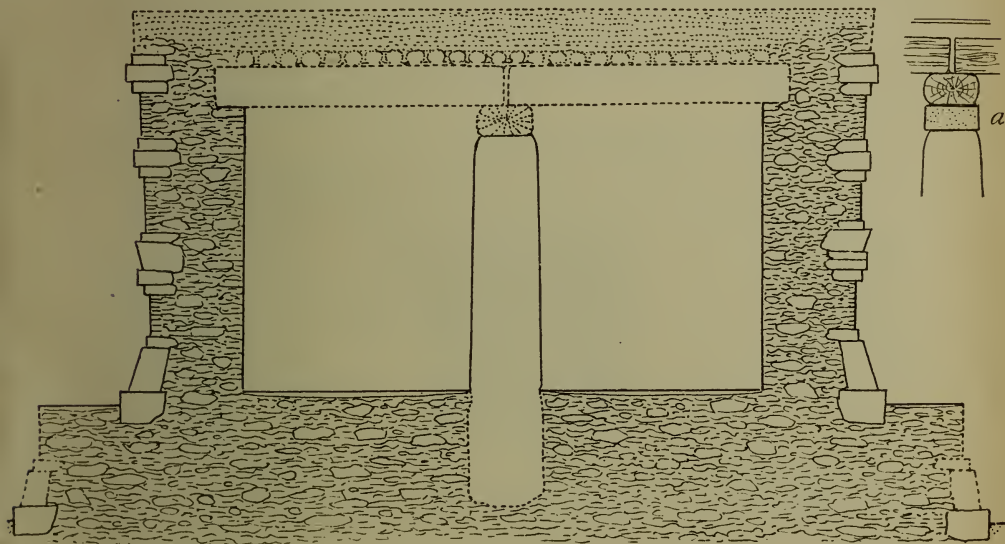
TRANSVERSE SECTION OF BUILDING OF DOUBLE BEAM SPAN.
